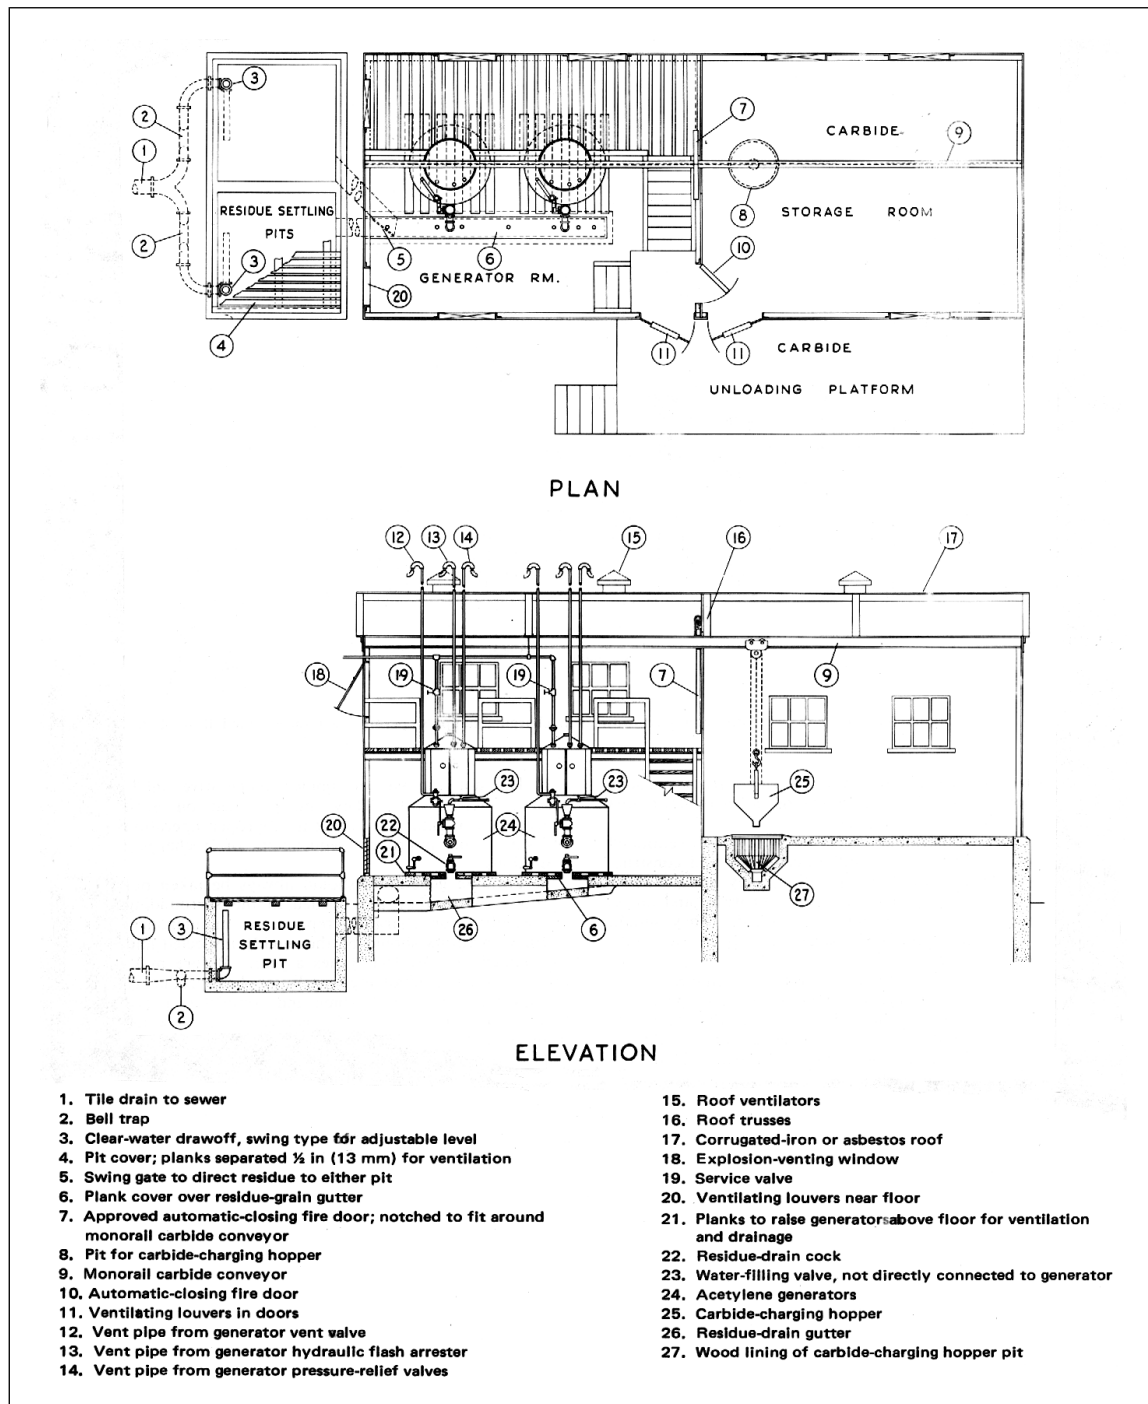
Typical acetylene-generator house. Walls, roof, and interior partitions of corrugated iron or asbestos on steel frame.
